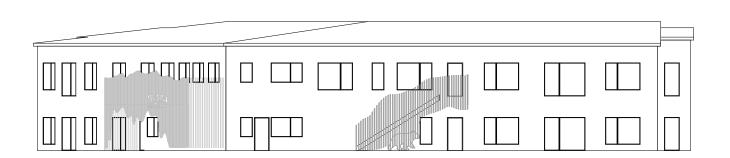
Elevations in scale 1:250, linework only to show facade pattern and shape of the staircase railings clearly.
